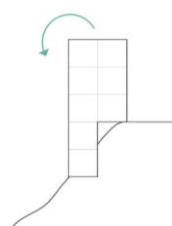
Risk of building overturning (Shock Safe Nepal group 1).
